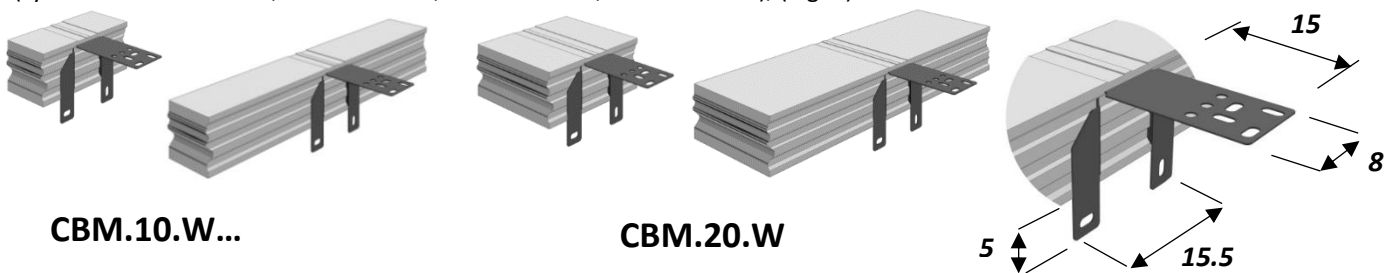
CBM model – with inner bracket - installation to a jamb plane
